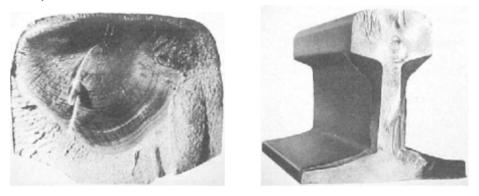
Welding, flash butt joint, transverse crack
